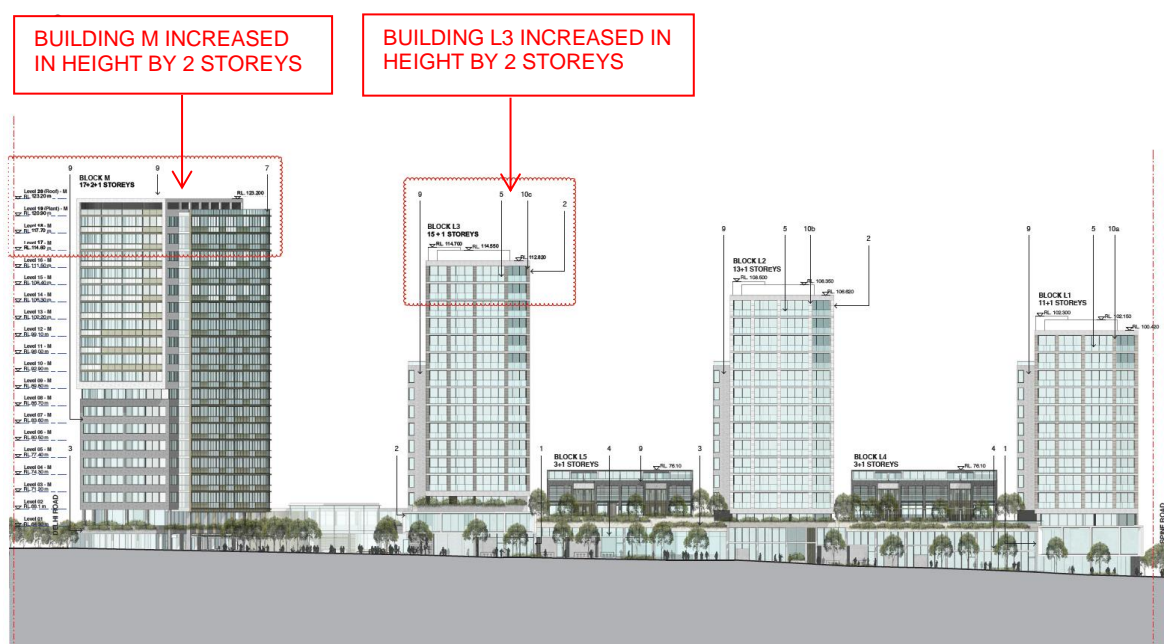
Amended DA East Elevation showing Buildings M, L1, L2, L3, L4 and L5 (Jarvis Circuit)
